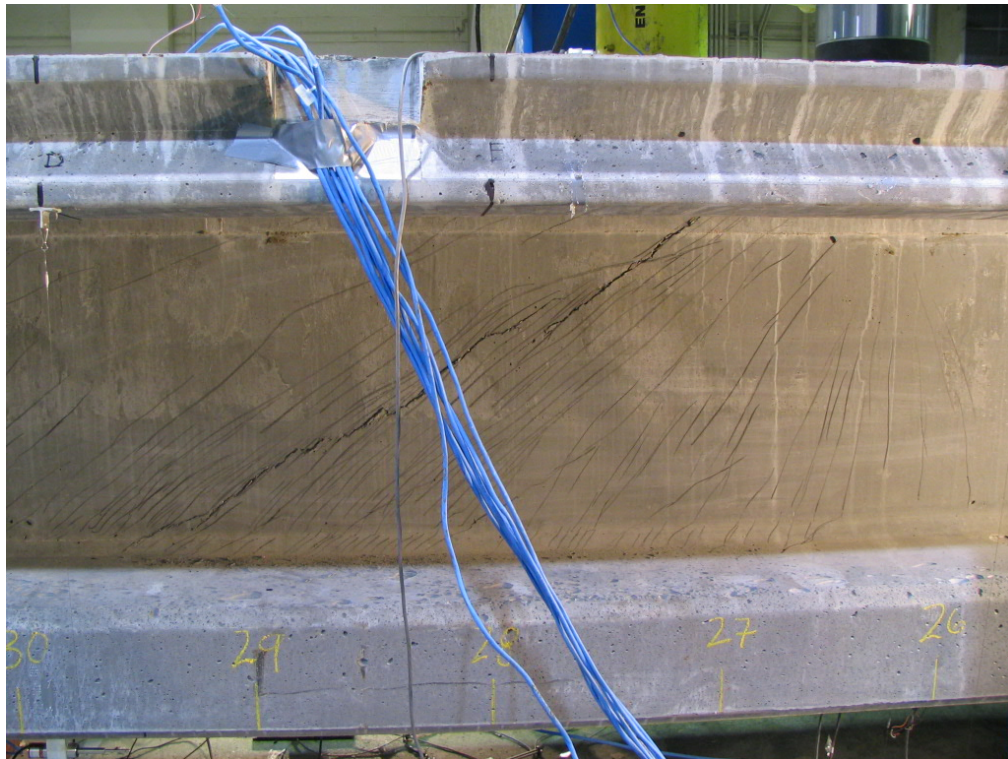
Photo. North face of Girder P2-21S after shear failure.
